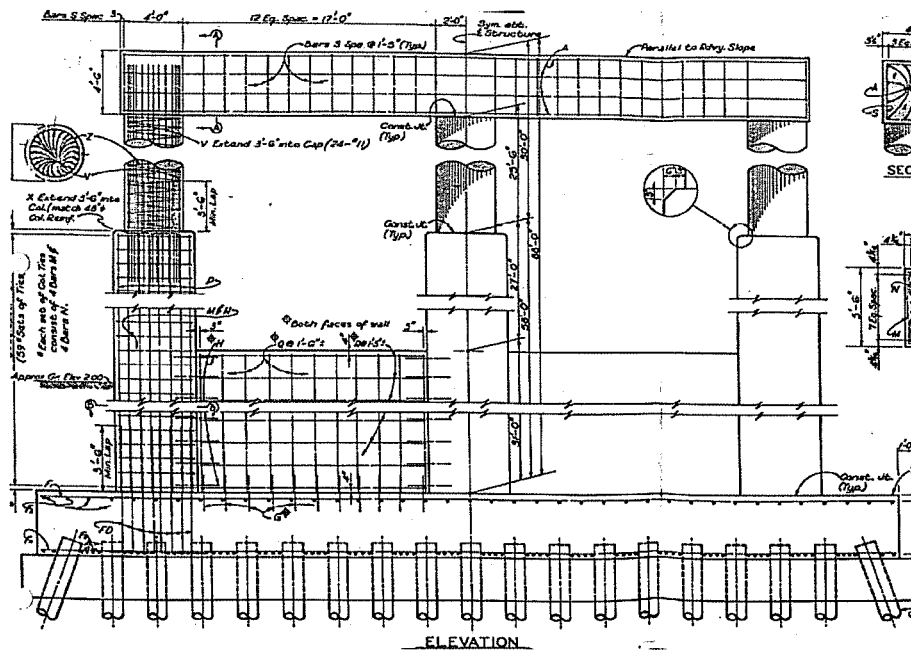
SH87 Bridge Pier (TXDOT Construction Documents, 1969)
